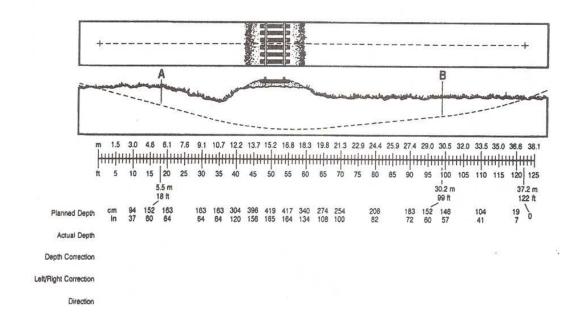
Initial Bore Plan (Source: Ditch Witch®)
